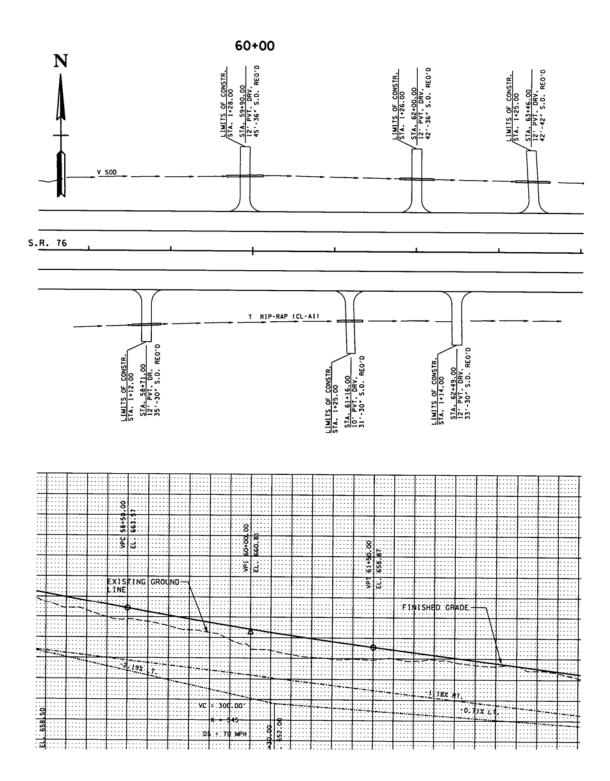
A-13. Portion of Proposed Layout Sheet (Special Ditch)
